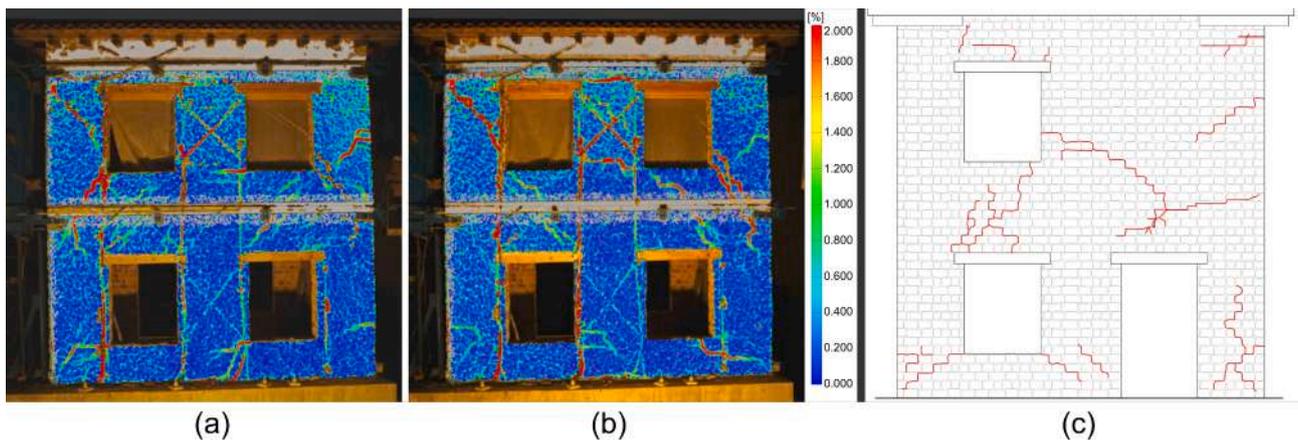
URM building cracks (maximum strains) on the East wall at the end of the test, detected by the DIC System for negative N-S (a) and positive S-N (b) loading directions, and crack configuration on the West wall (c).
